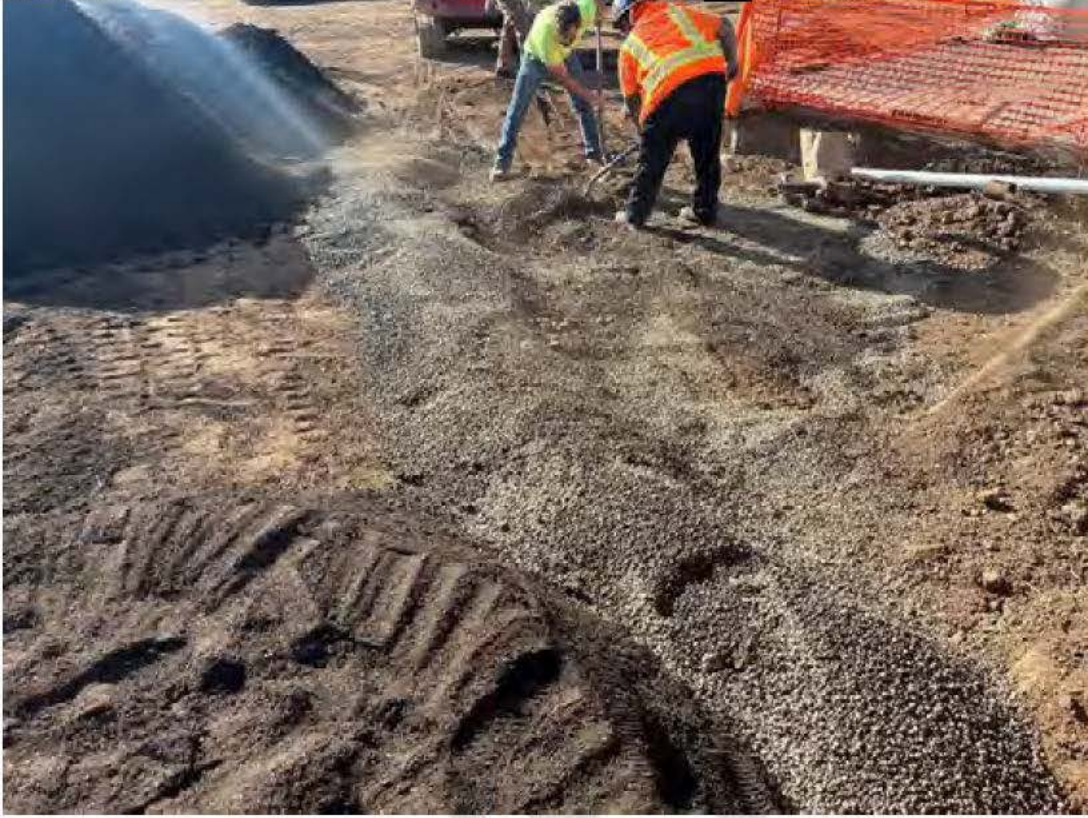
Fence repair at [REDACTED] Baxter. Photo taken facing north.
